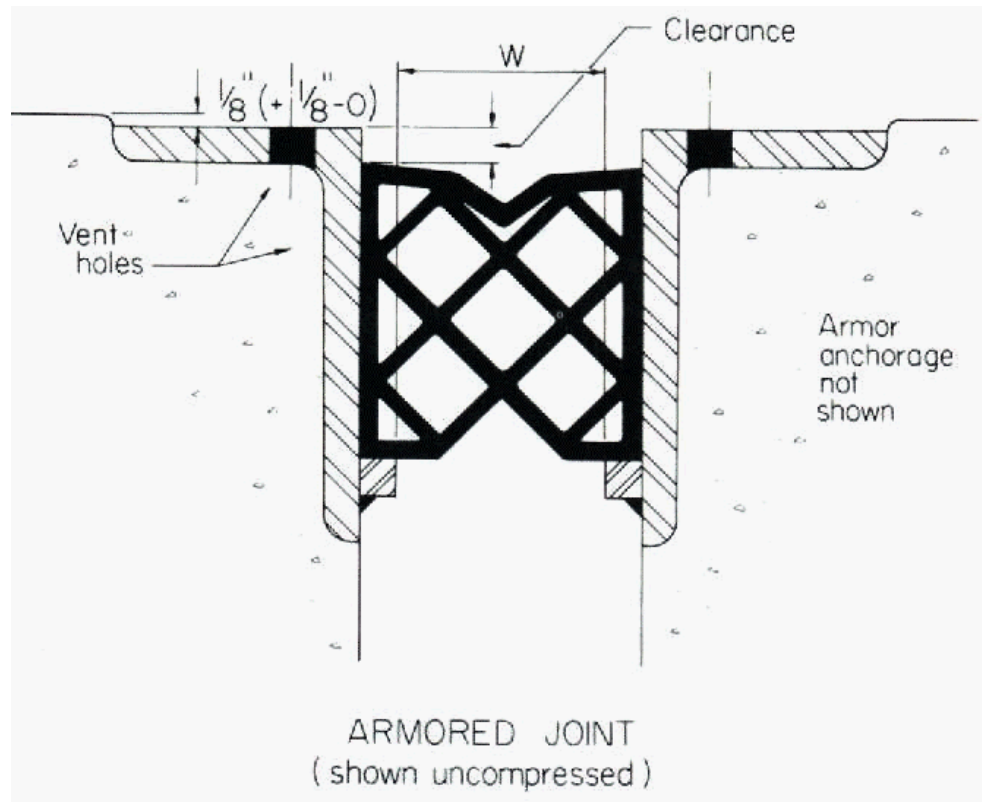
Cross Section of a Compression Seal with Steel Angle Armoring
